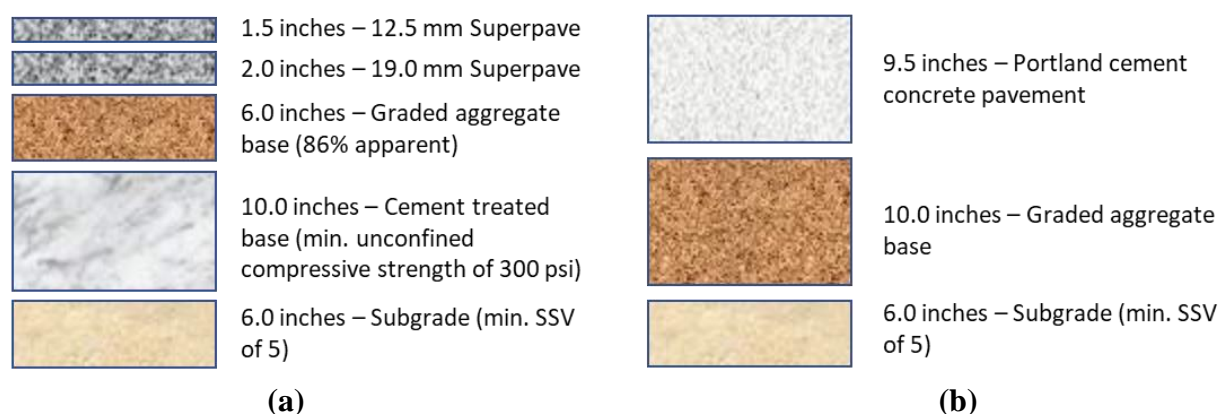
South LaGrange Loop designs for; (a) inverted pavement section and (b) PCC section [Lewis 2012].
